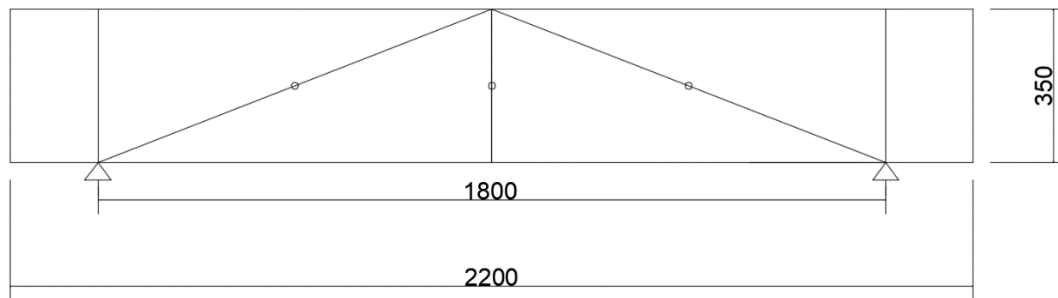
Out of Plane Deformation Measurement Holes (Trial Beam)
